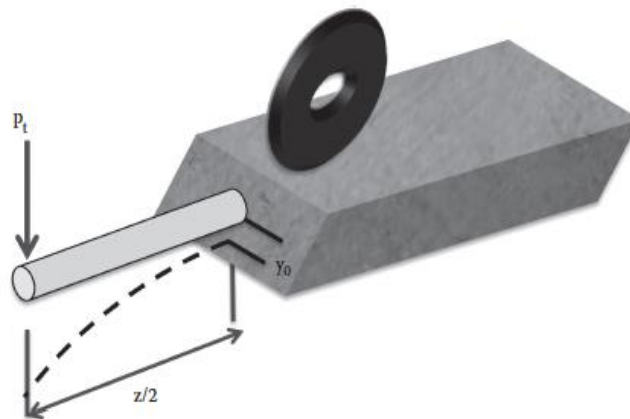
Schematic Showing Dowel Deformation Under Load at a rigid pavement joint (El-Korchi & Mallick, 2013)
